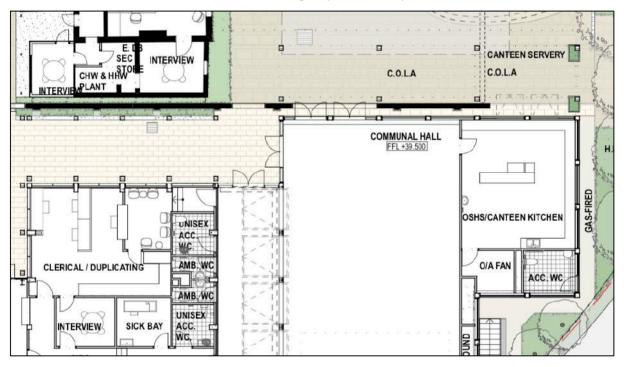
Extension of northern façade of communal hall (Building G) close to heritage wall.
